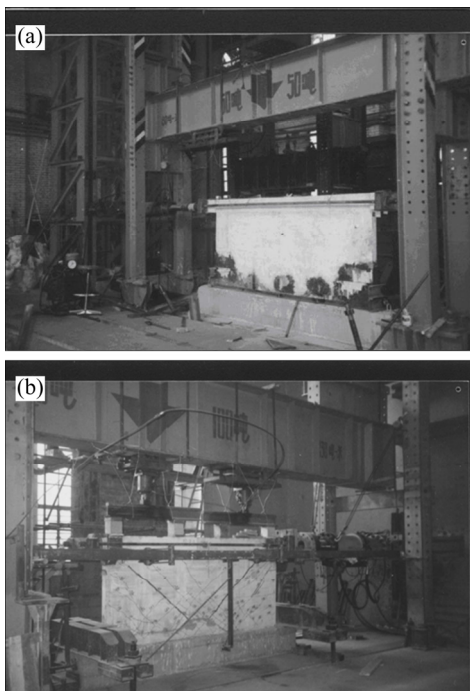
Loading set up: (a) Front view of loading set up (specimens SW1 to SW5 and SW7); (b) Rear view of loading set up (specimens SW6)
